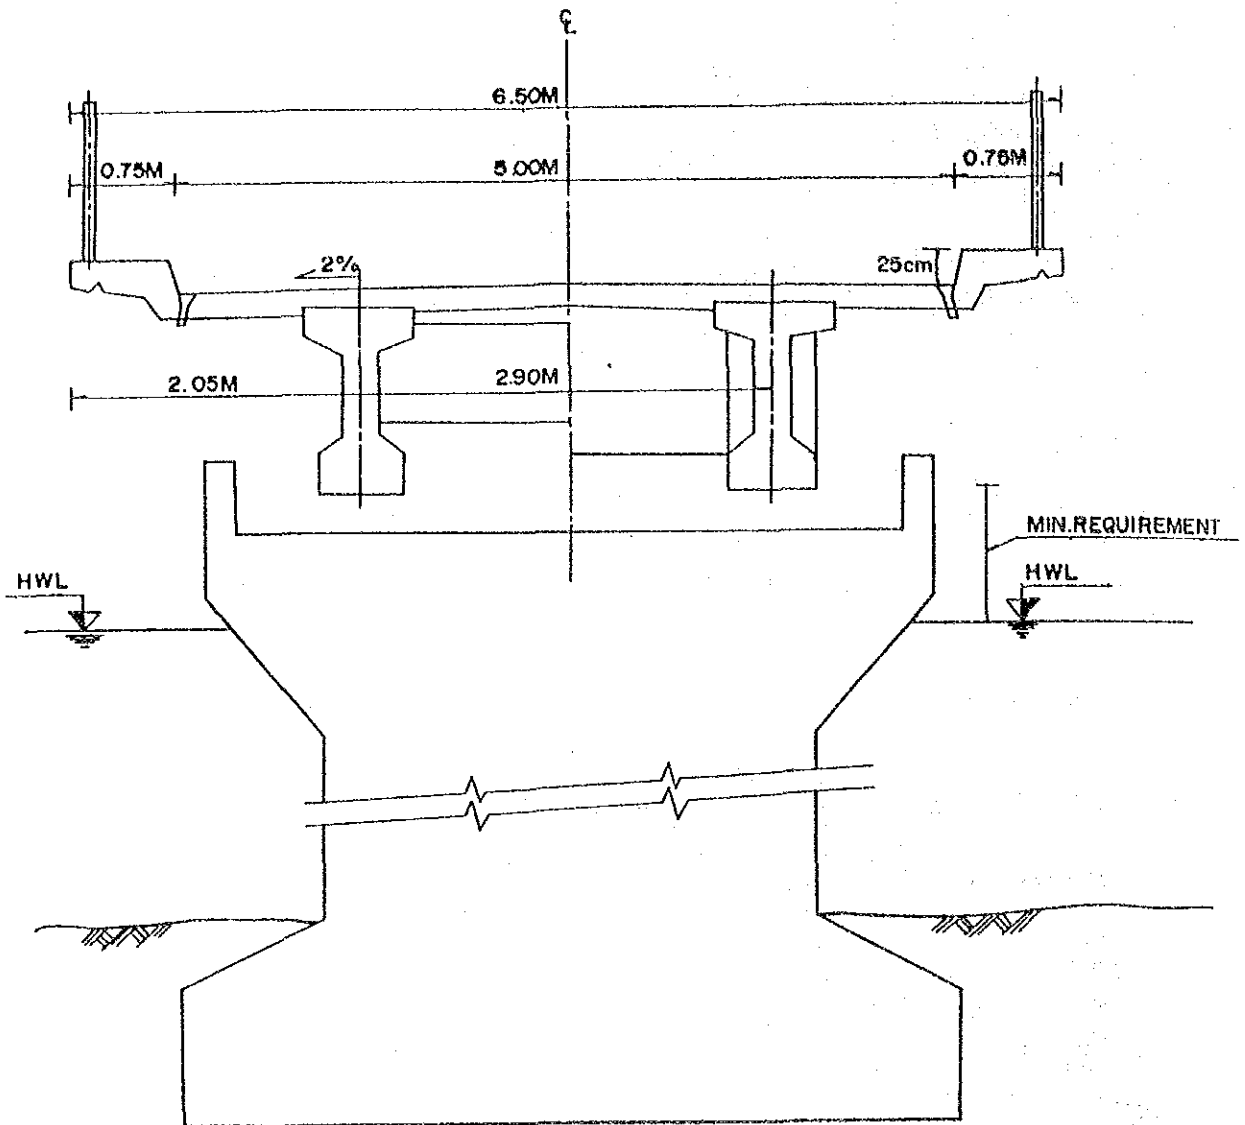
Proposed Bridge Cross Section No.2
